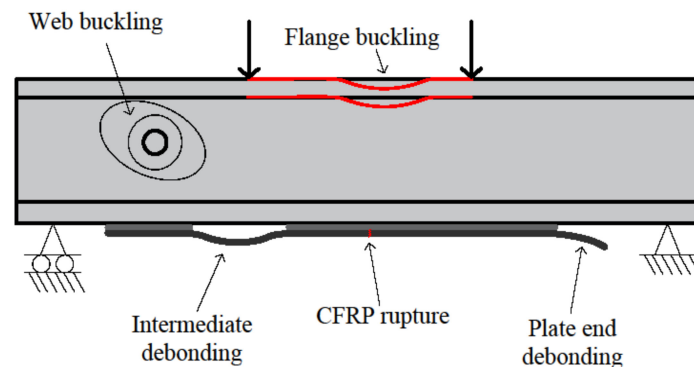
Some of the failure modes of steel beams strengthened with FRP plate [111].
